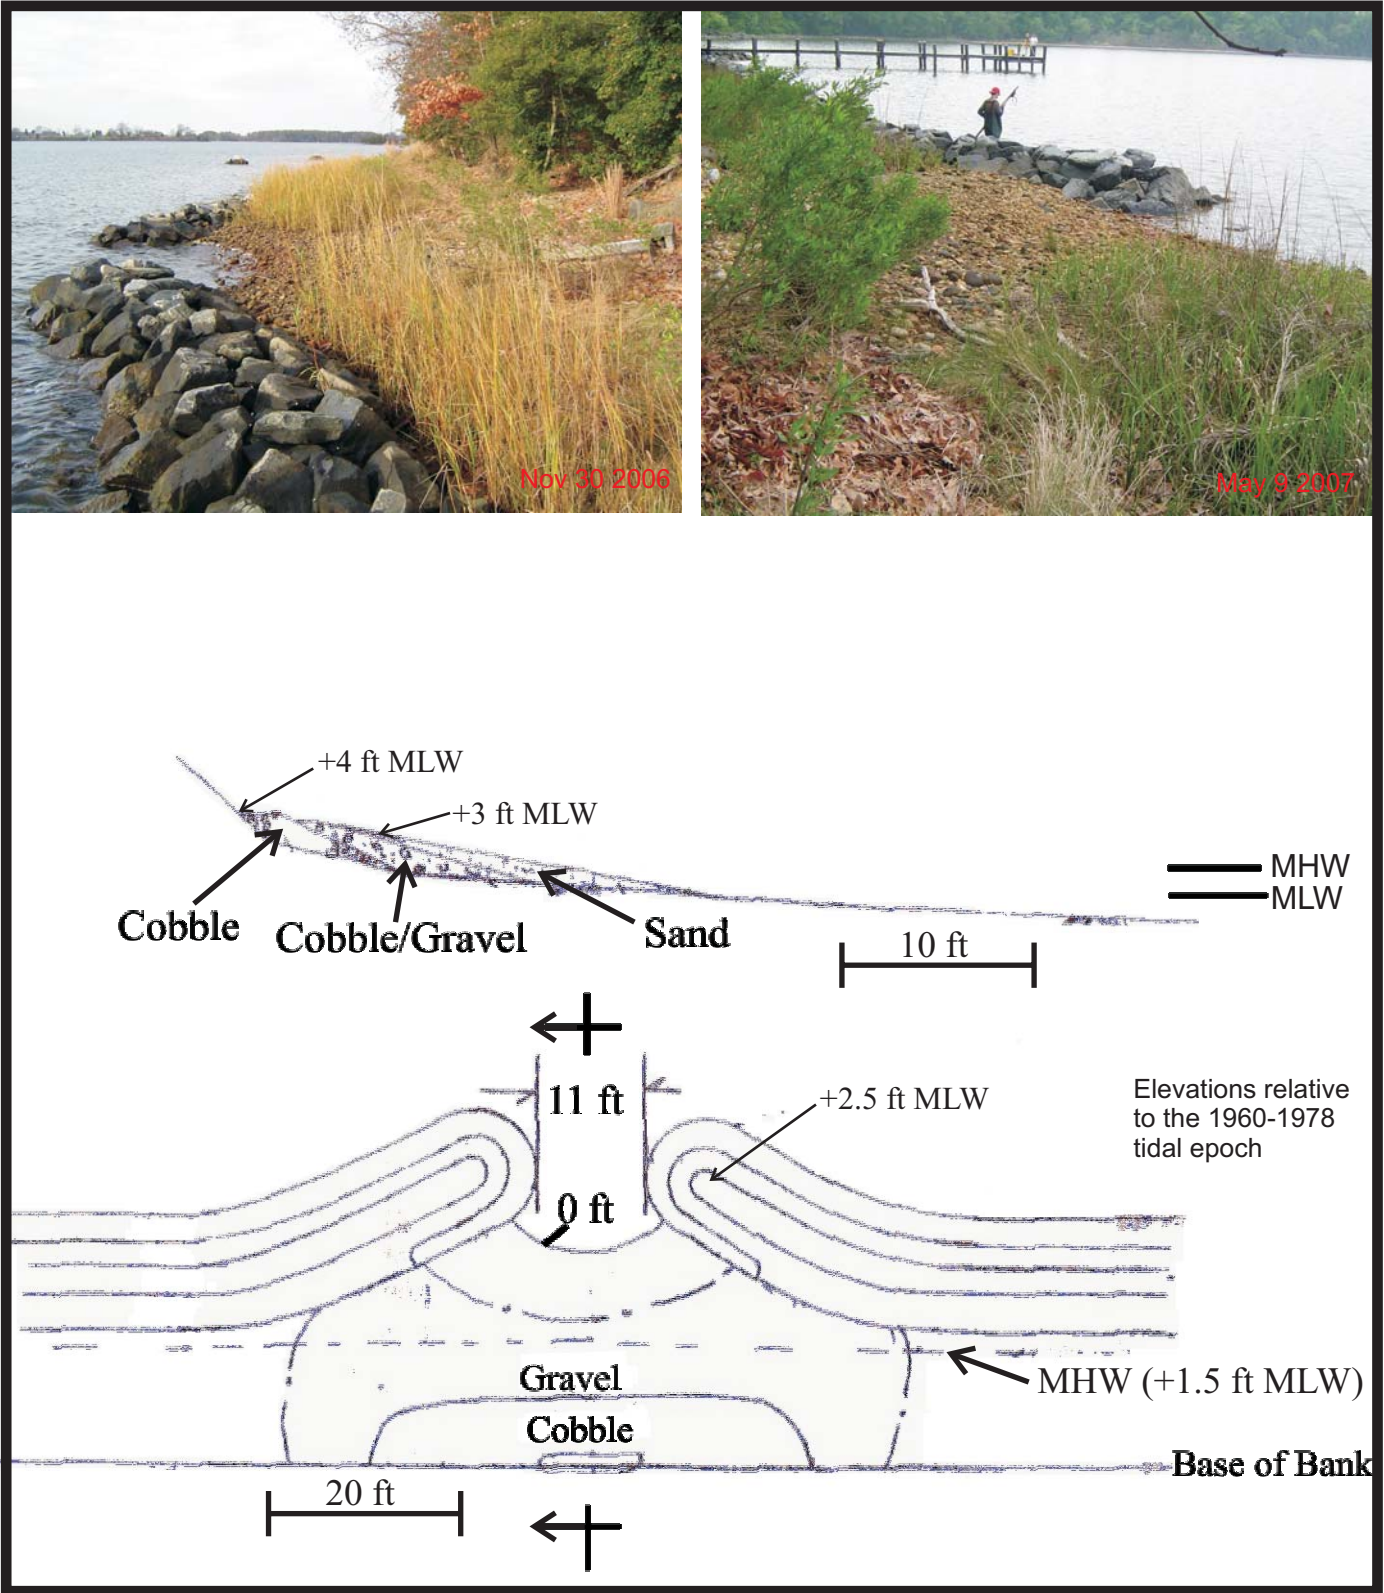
Photos showing Window 7 in 2006 and 2007. Window 7 is a Type IIB window or vent along Site 1 with a gravel and cobble backshore as shown in the planform and cross-sectional design.
